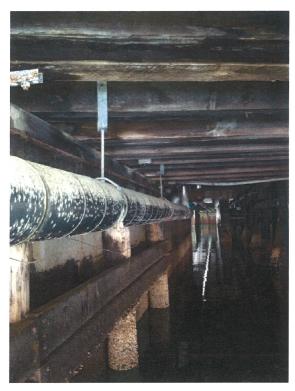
TIMBER PILED JETTY AT TIMBER CRIB LOOKING SOUTH - NOTE FENDERING AT FACE OF TIMBER CRIB
